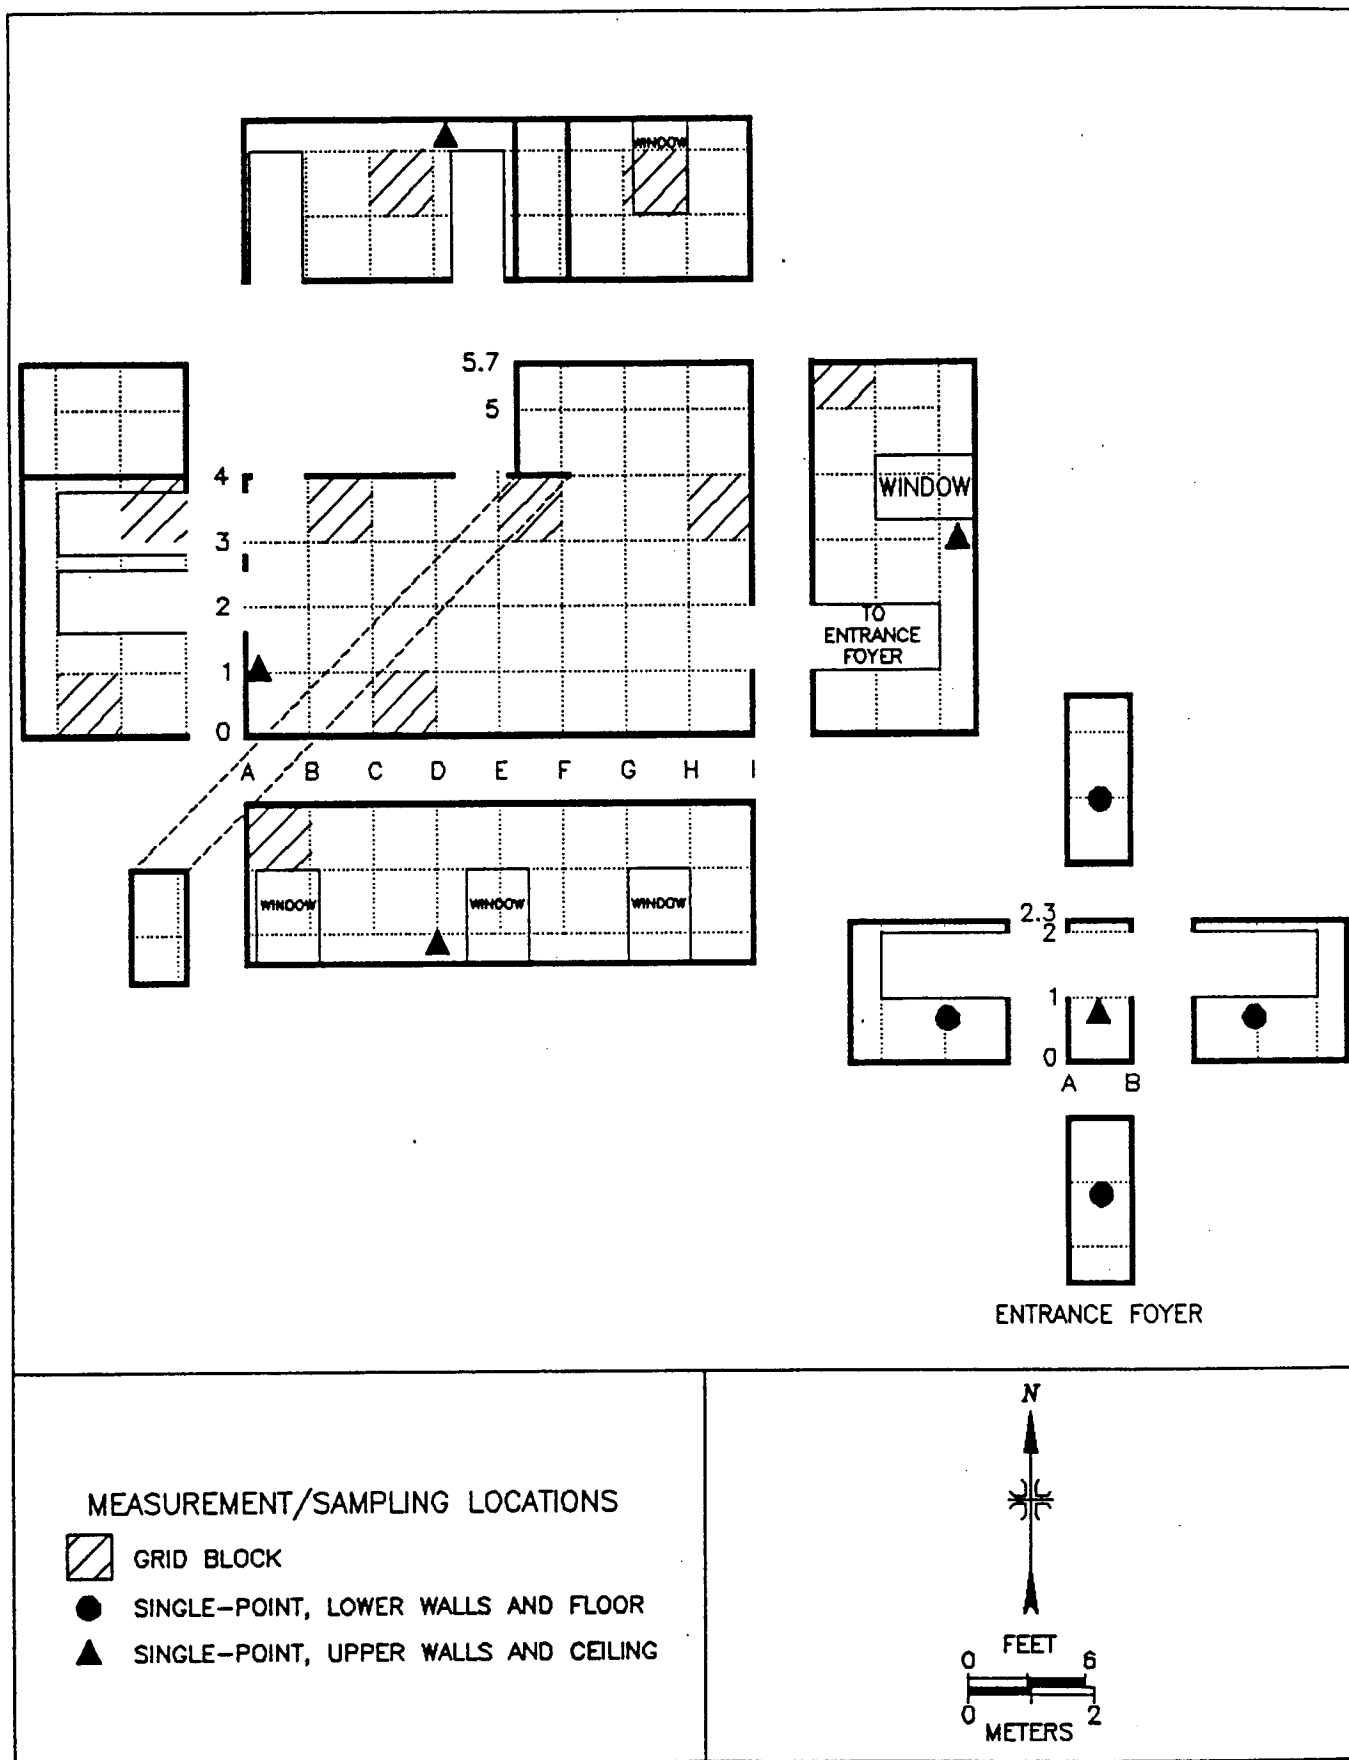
Building 429, Room 3 (Entrance Foyer Connected to Room 2) - Measurement and Sampling Locations
